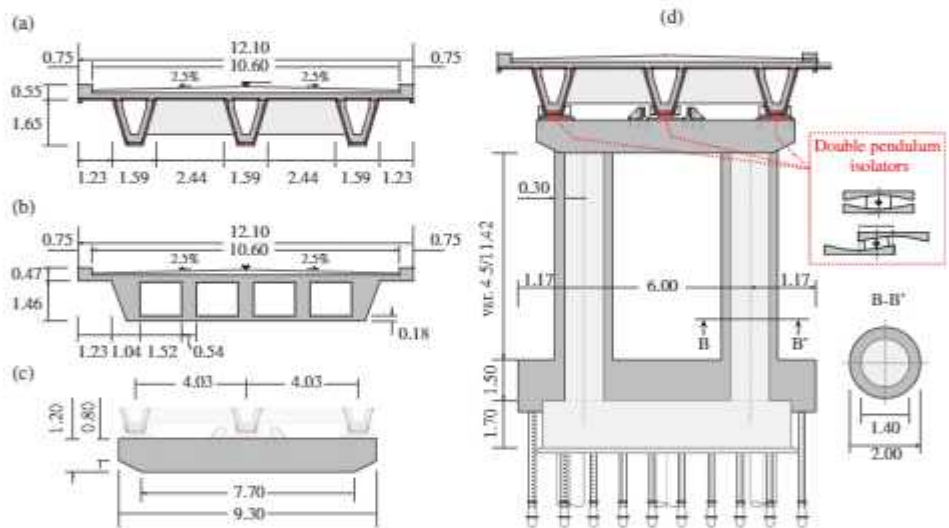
Viaduct dimensions: (a) V-shaped reinforced concrete beams cross-section; (b) adjacent box beam cross-section; (c) columns bent; (d) lateral view of the pier-deck system (units in [m]).
